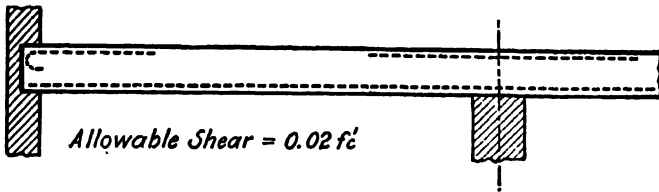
Typical reinforced concrete beam; principal longitudinal bars not anchored.
